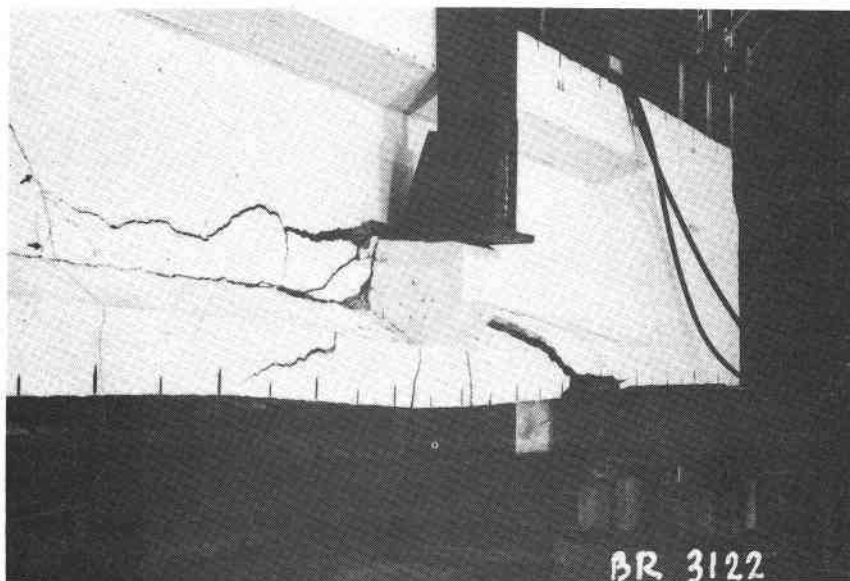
Cracking At Purlin Seat at DL + 13 LL.
